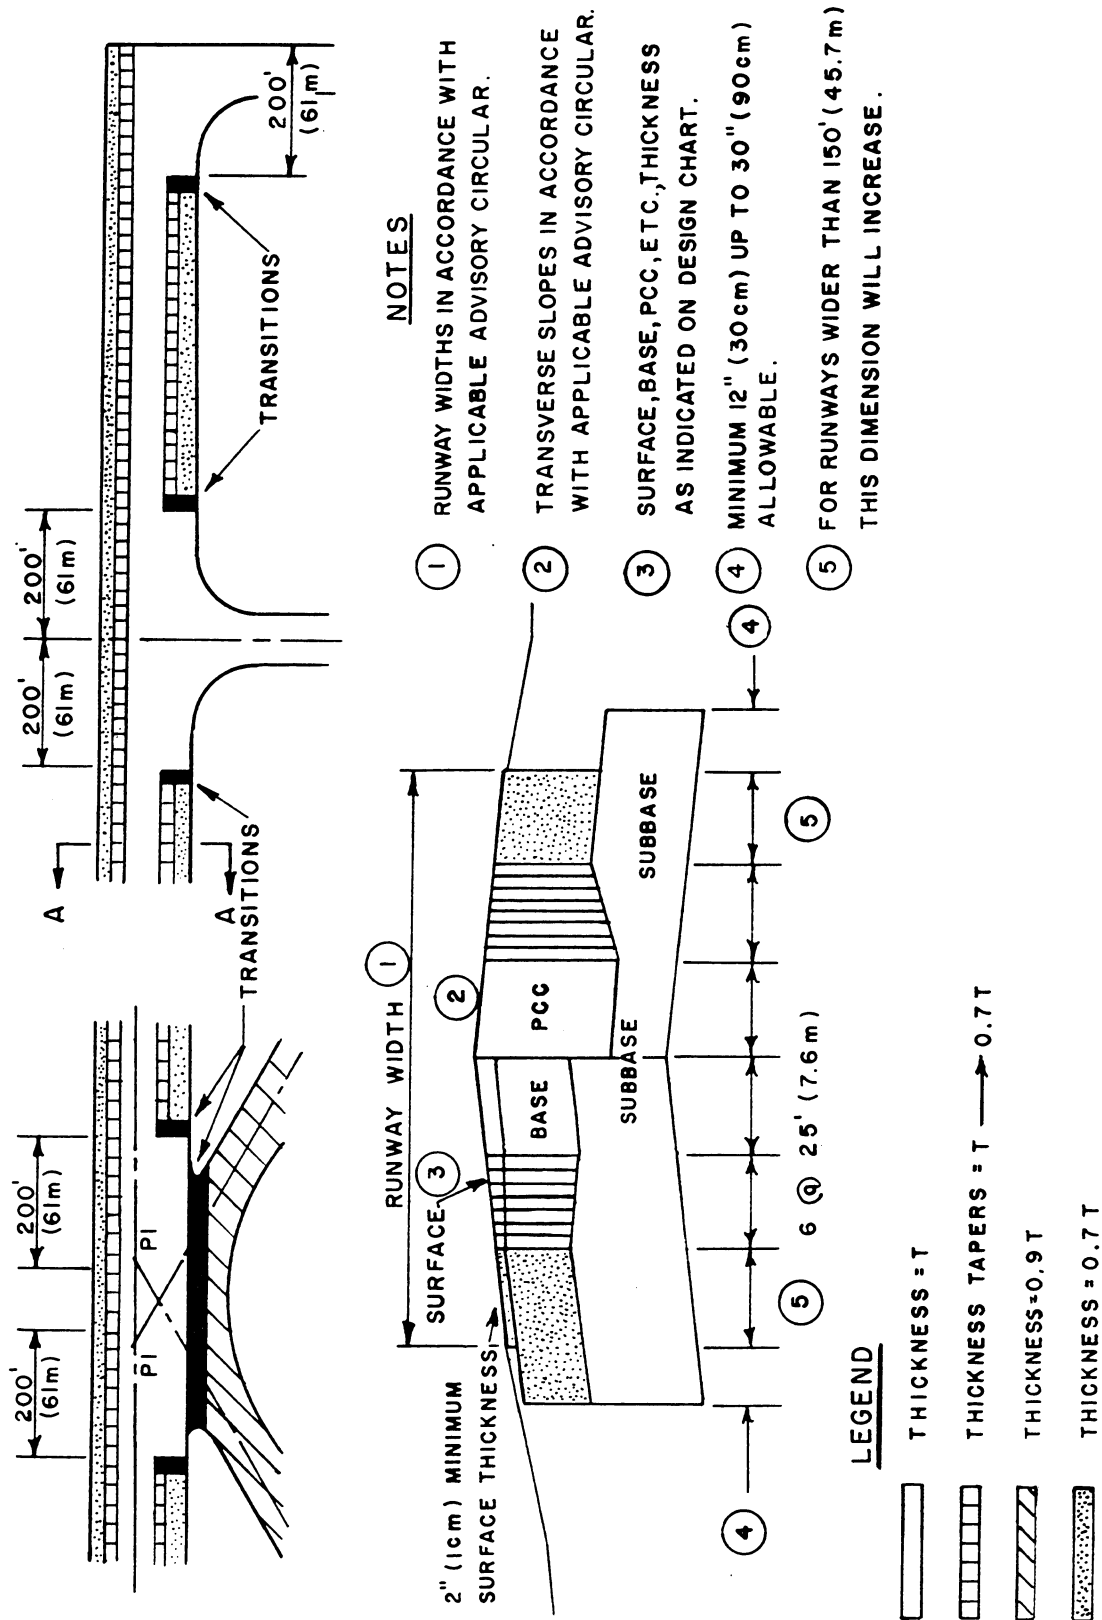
TYPICAL PLAN AND CROSS SECTION FOR RUNWAY PAVEMENT
